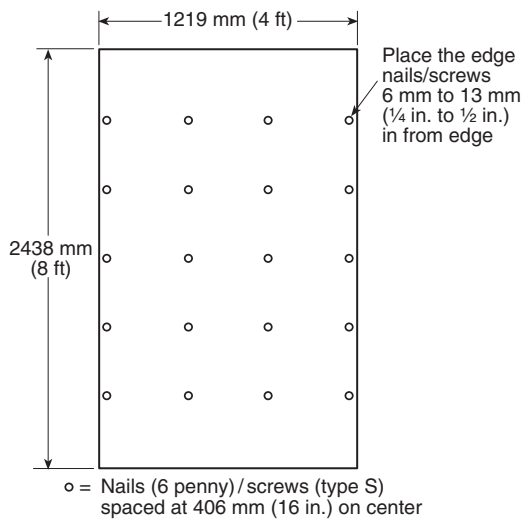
(c) Attachment details for flexible wall materials.
